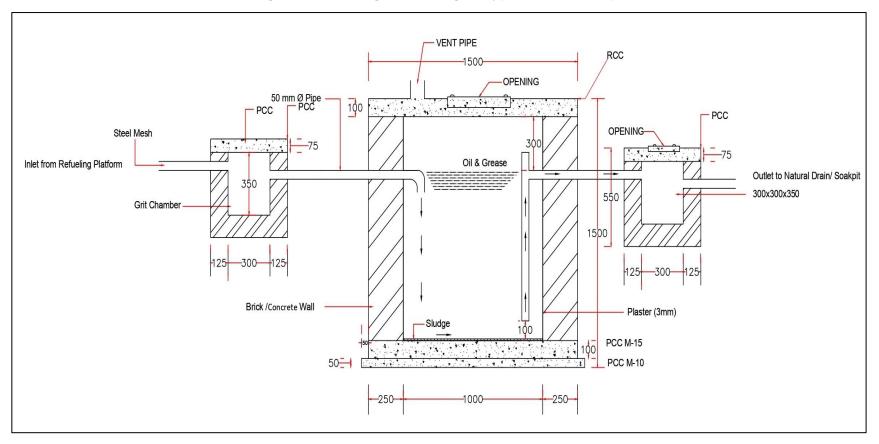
Drawing of Drawing of Typical Oil Interceptor
